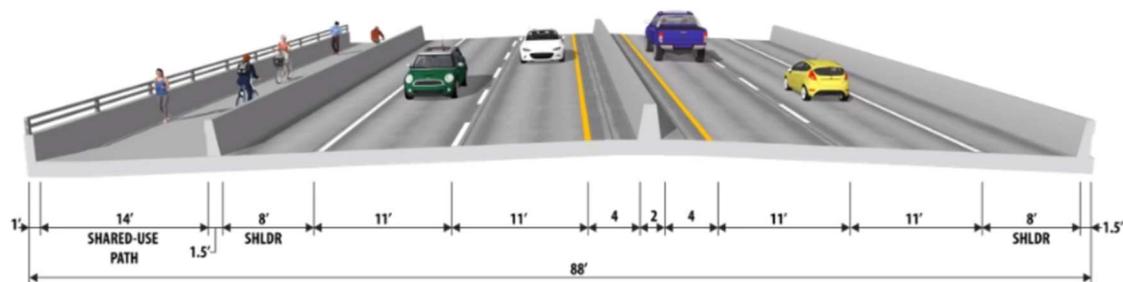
Typical Section and Elevation Rendering of the Proposed Bridge
